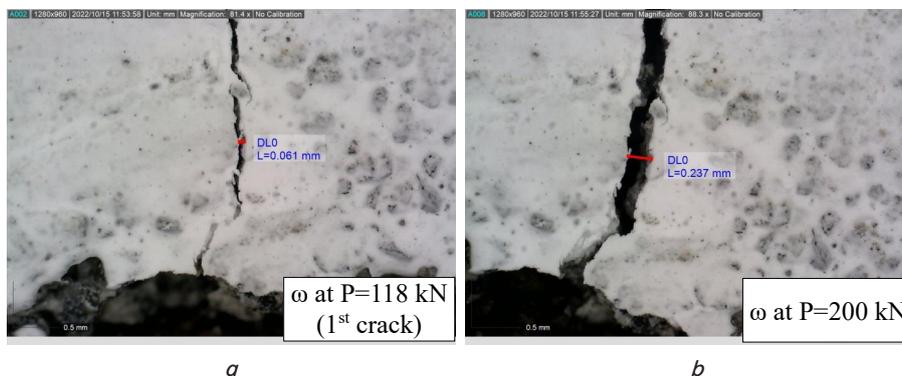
Crack width for specimens f_c' 35 MPa: a – initial crack; b – final crack
